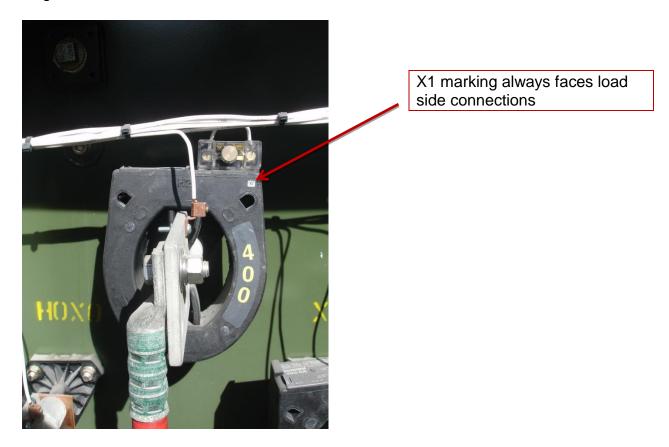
Window Type CT Installed on Padmount Transformer Secondary Bushings
